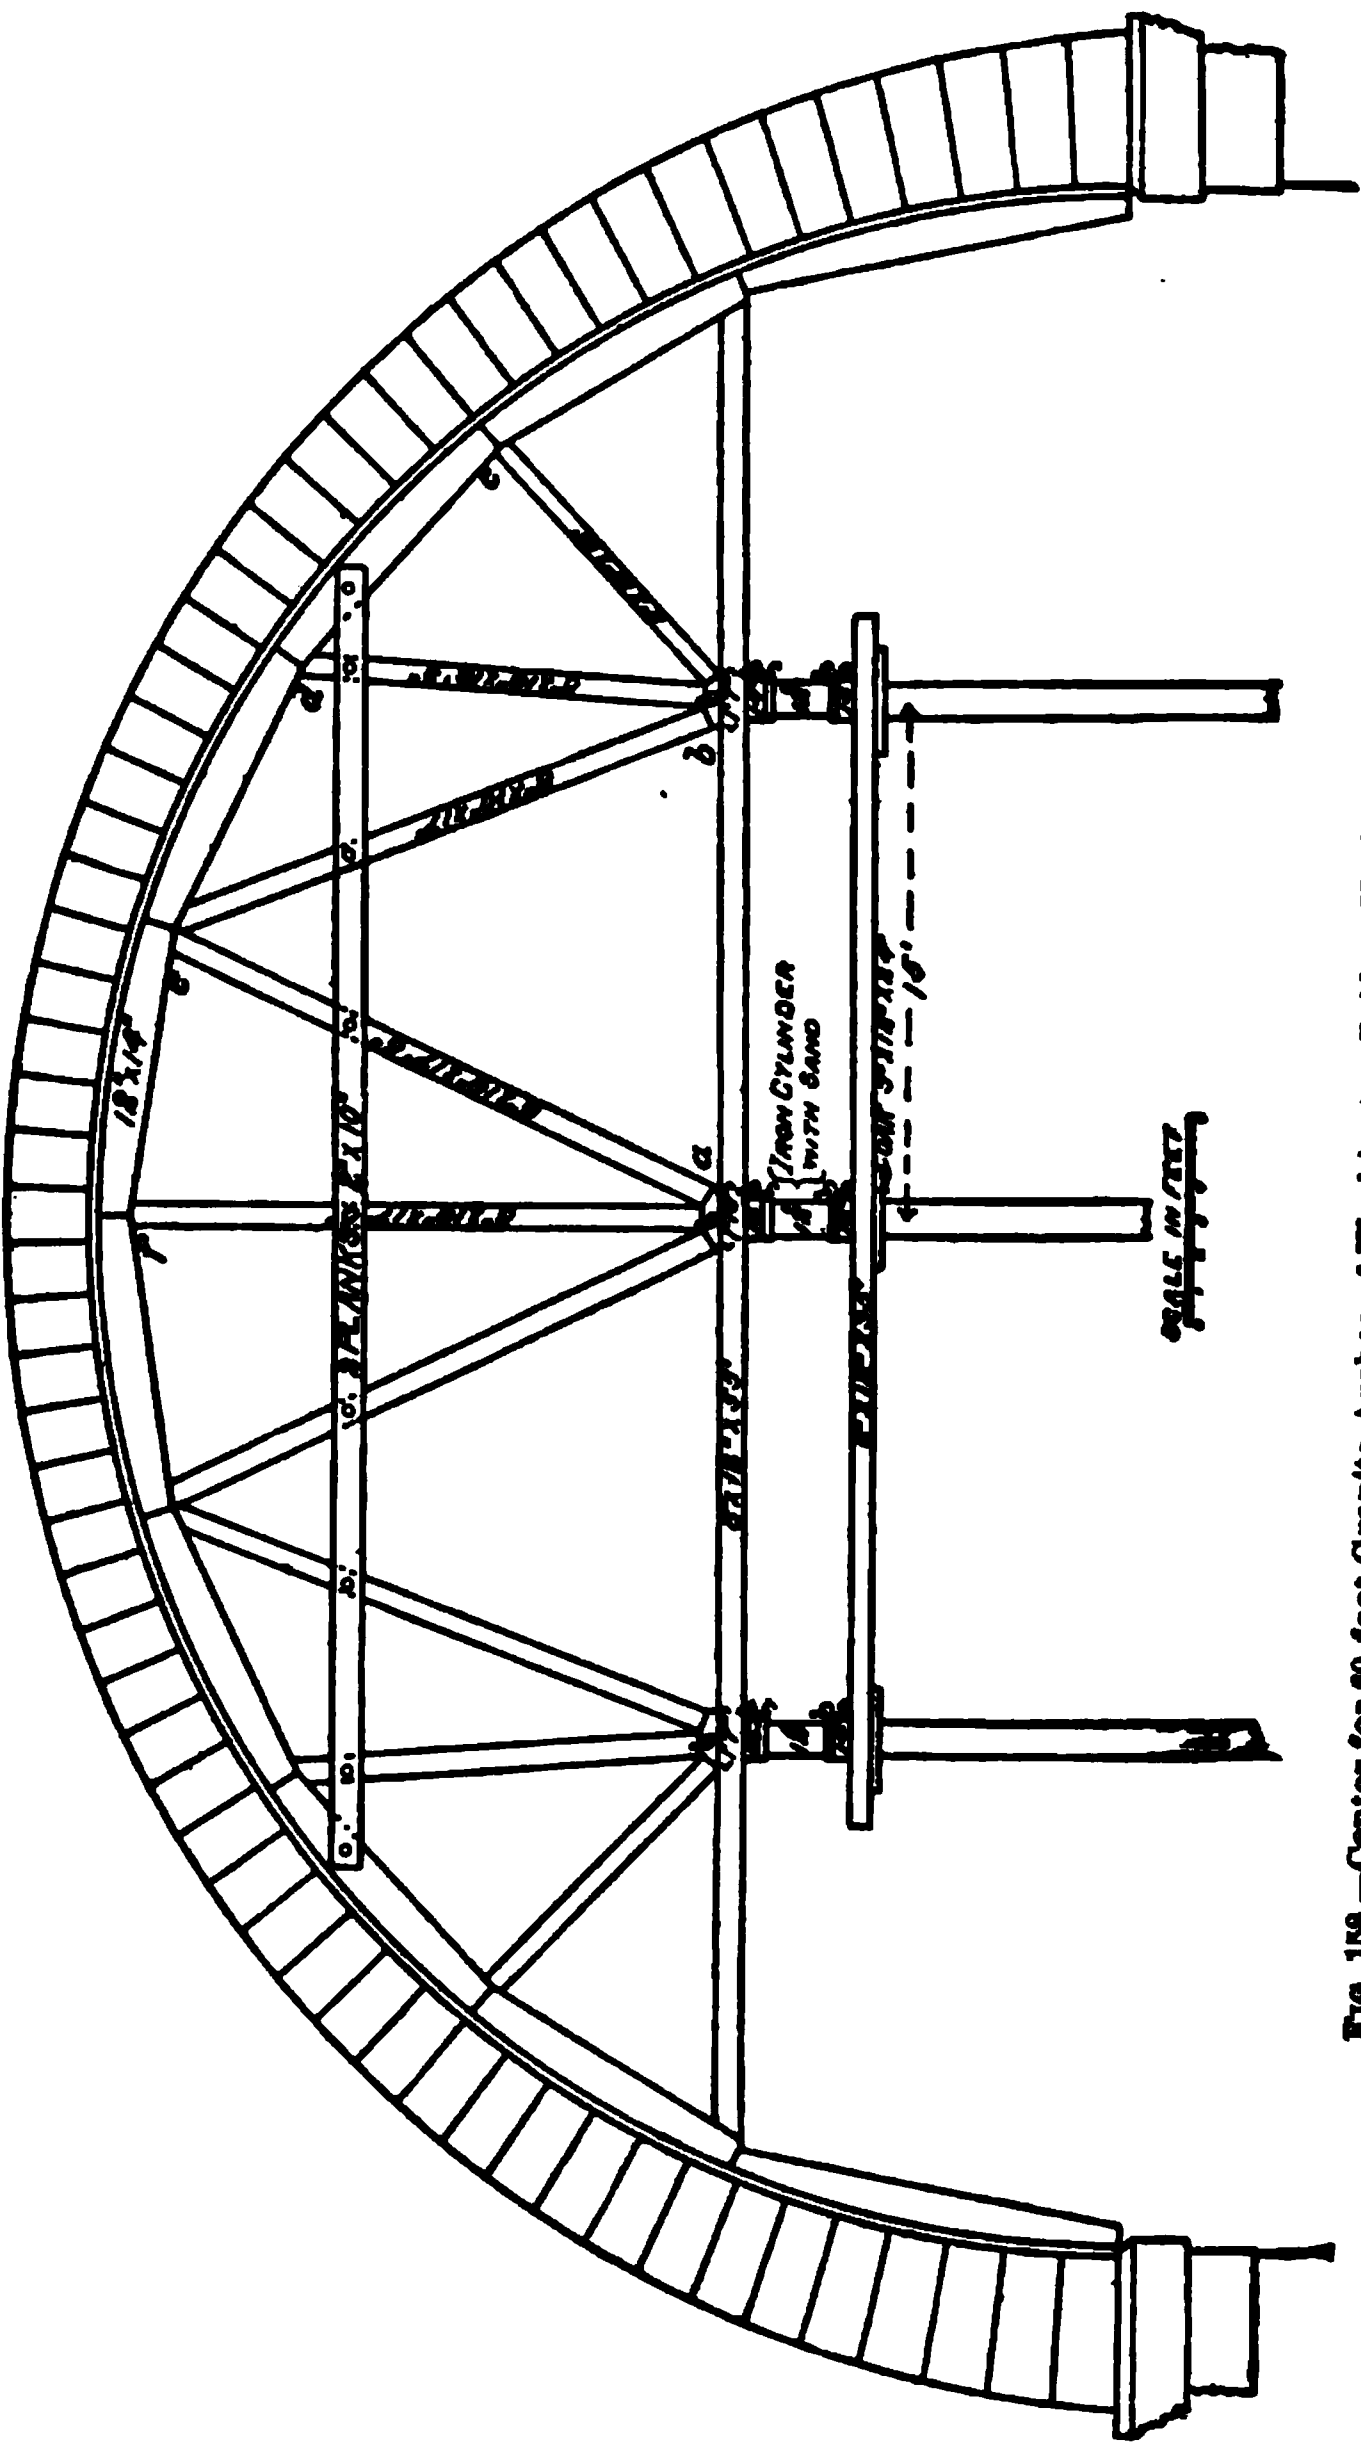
Center for 60-foot Granite Arches of Washington Bridge, Harlem River, New York City.
